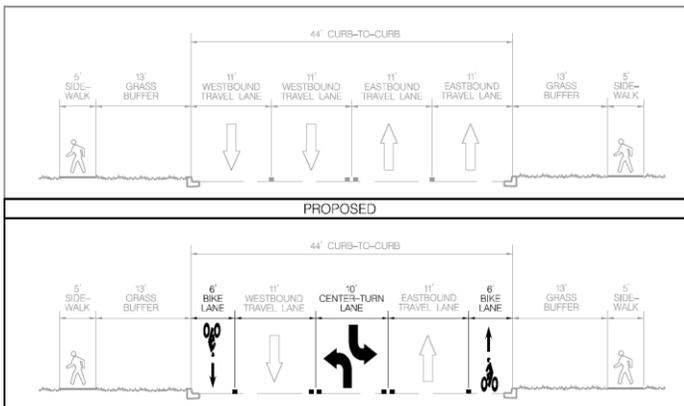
Existing and proposed typical cross-section for Tamar Drive
